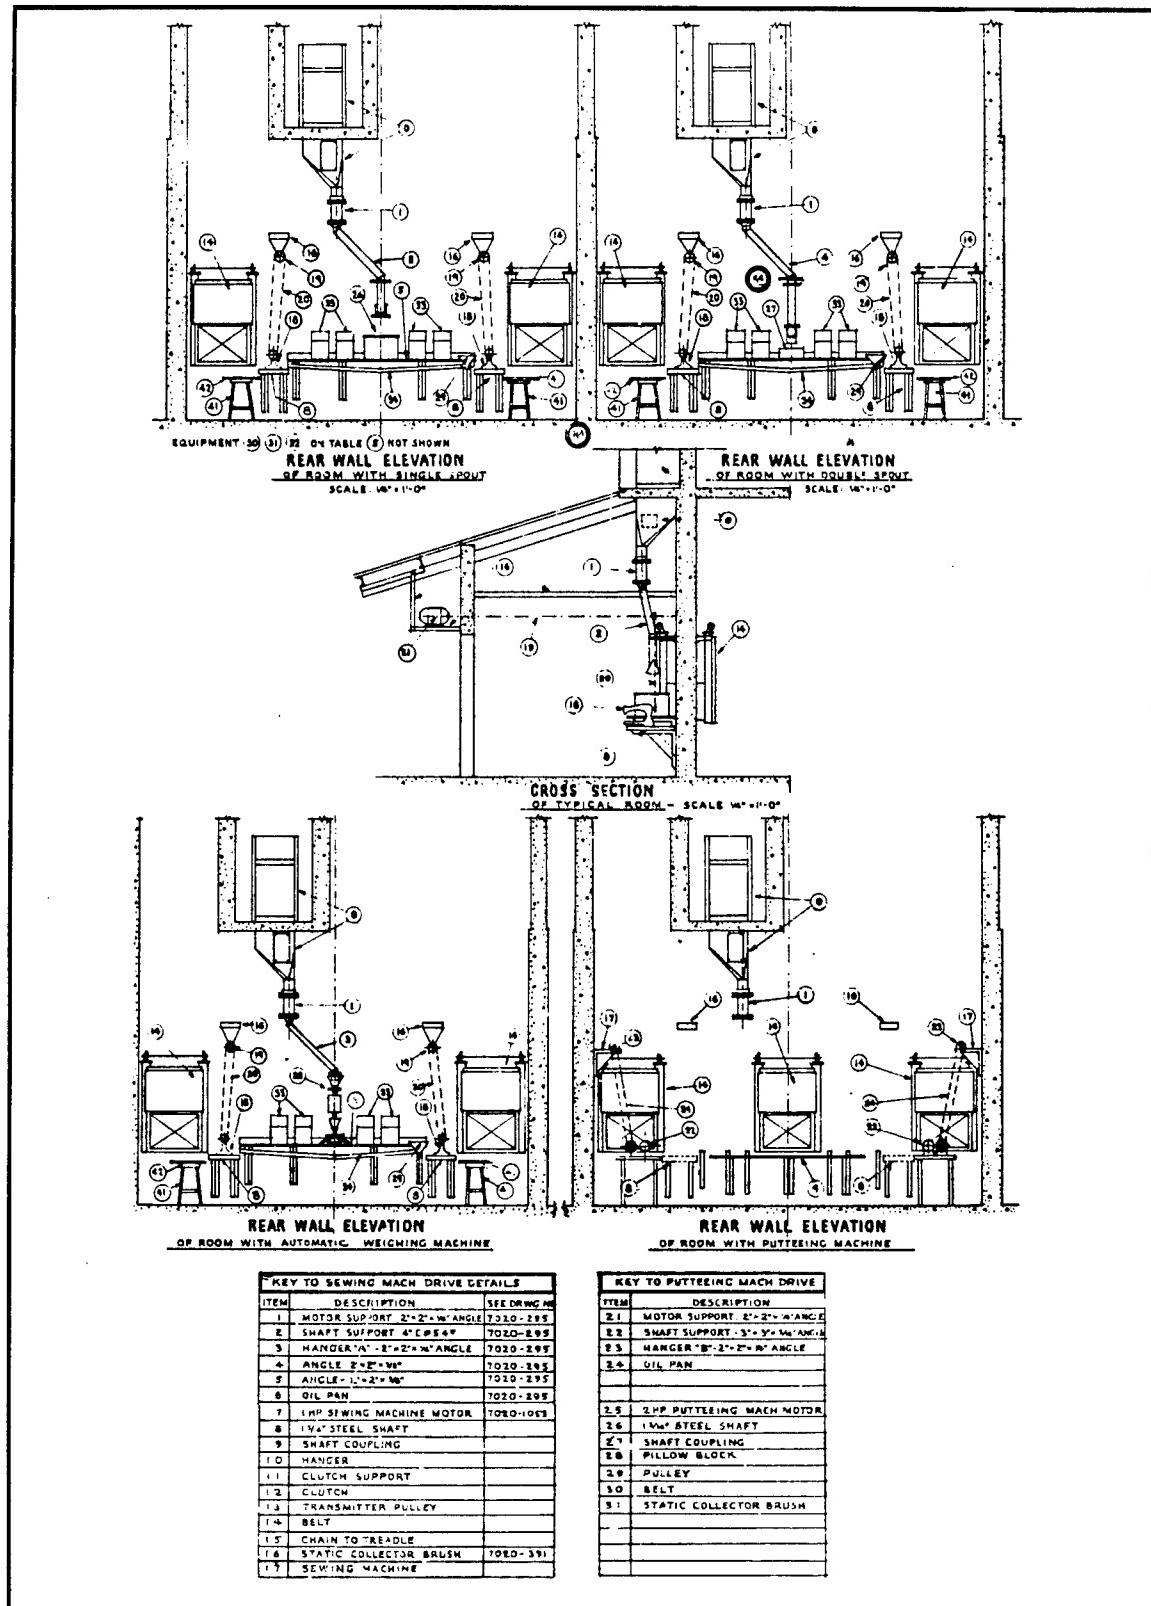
Arrangement of equipment in the LAP building loading booths, Hoosier Ordnance Plant (INAAP Drawing 7020-165).
